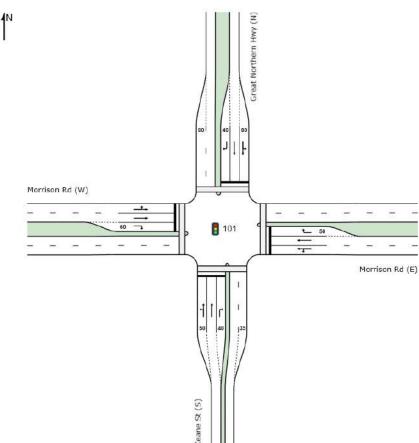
Great Northern Highway / Morrison Road / Keane Street SIDRA Layout
